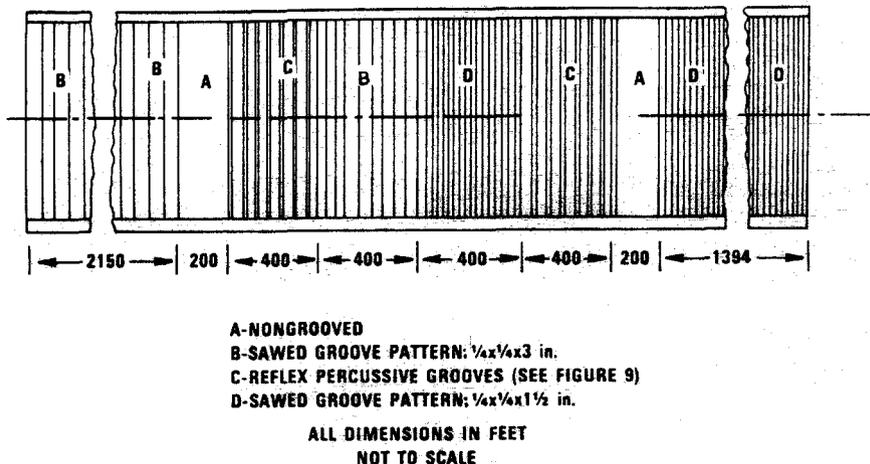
Test surfaces of runway 4/22 at FAA technical center.
